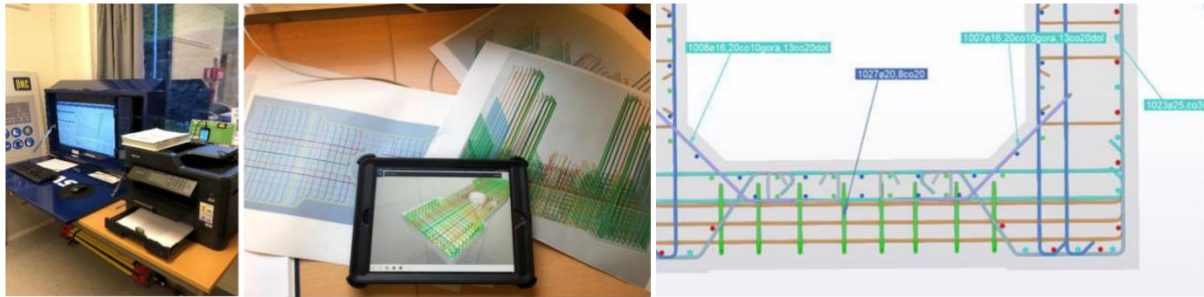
Randselva bridge BIM use on the construction site (Ulvestad and Vieira, 2021).
